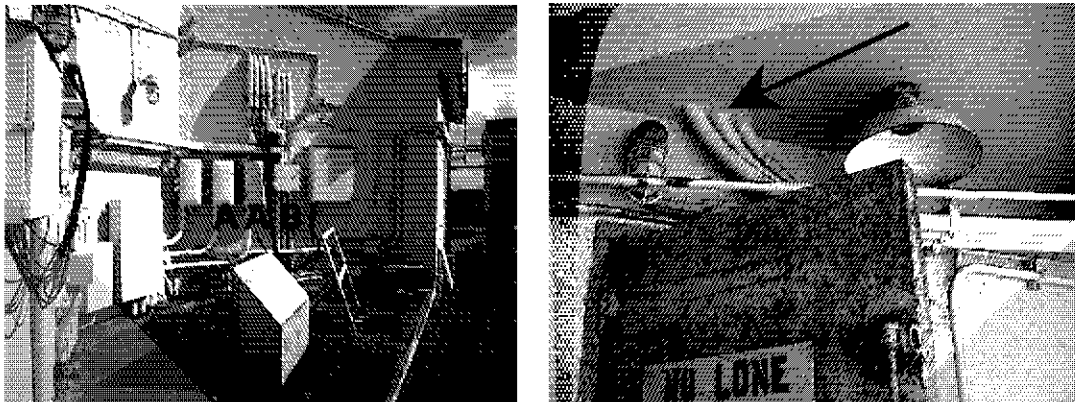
Launch building camera balcony (left) showing terminal boxes for sequential cameras (A) and TV cameras (B); TV camera conduit routed to control house (right) (ERDC-CERL, 2007).
